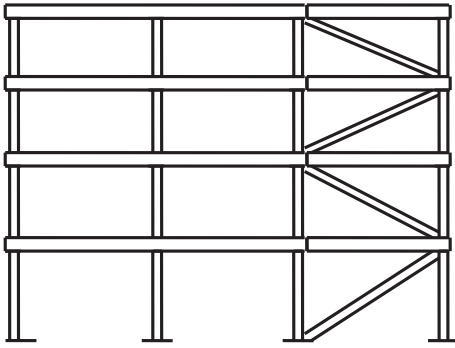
Columns and beams in a typical frame with discontinuous column.
